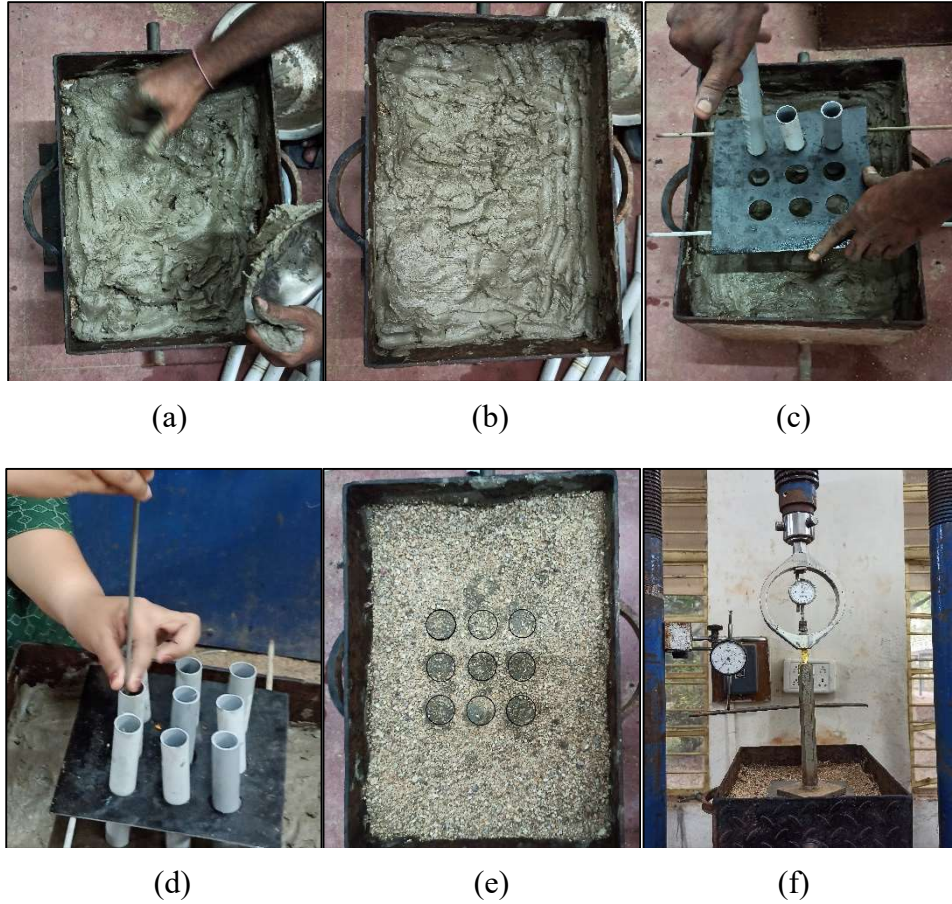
Preparation of model soft clay bed, installation of columns and loading arrangement
